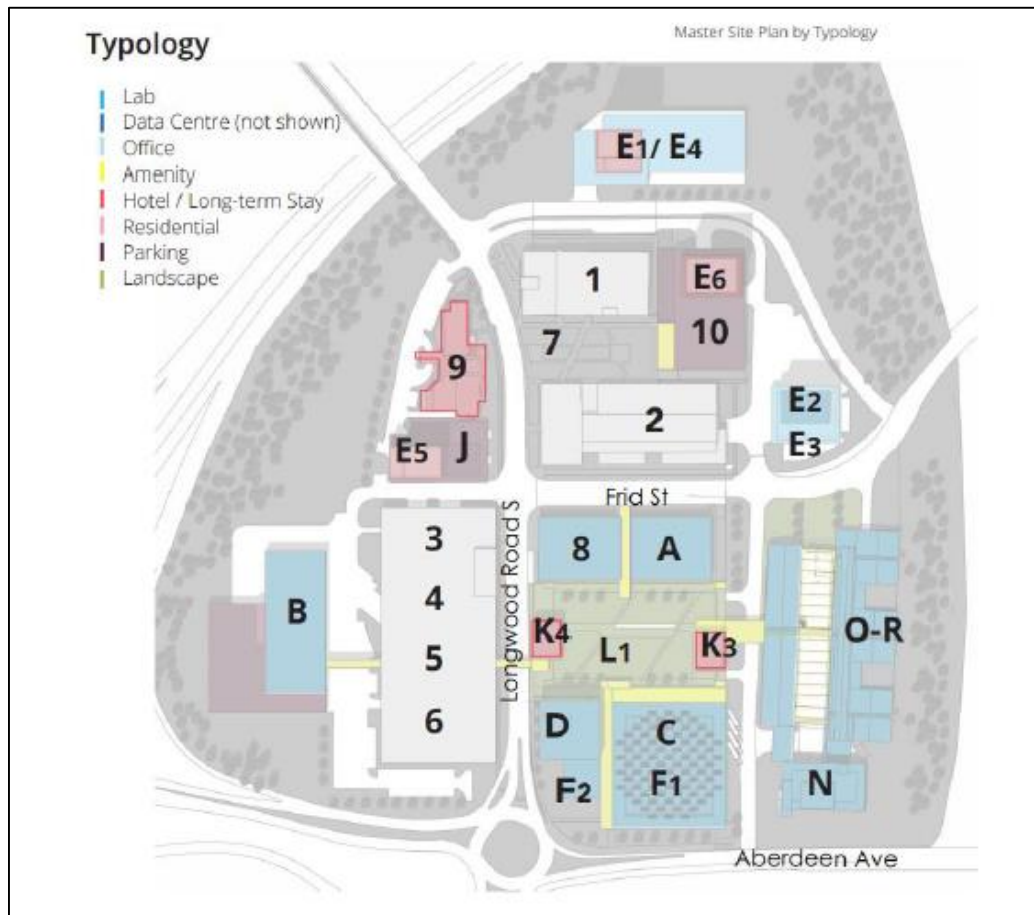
McMaster Innovation Park Master Plan – Building Typologies (from Refined Master Site Plan prepared by McCallum Sather)
